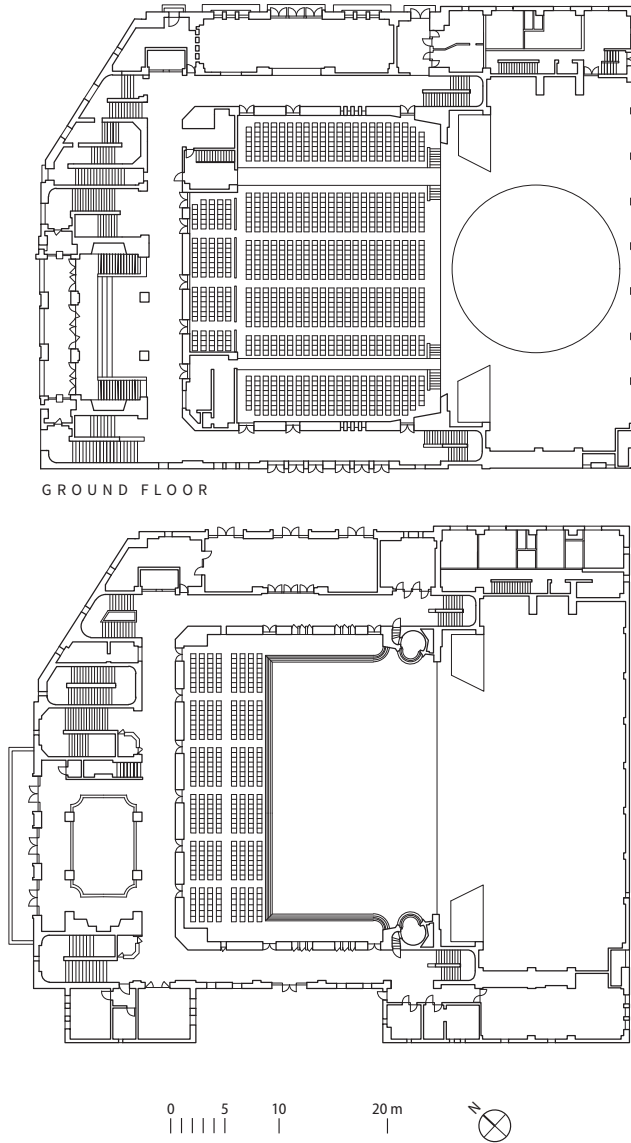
Ground floor plan (top) and first floor plan (bottom) of the Tokyo Gekijō (sections was not found), Scale = 1:700.
